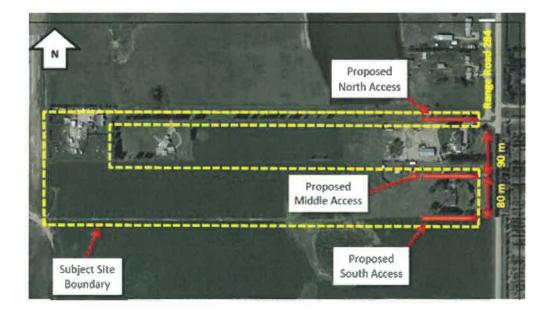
Proposed ingress/egress to Range Road 284 Plan
